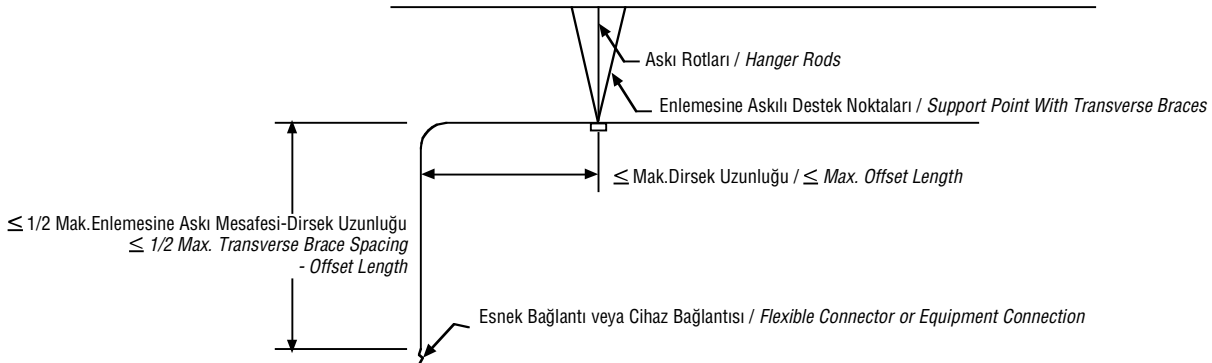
Bracing of pipe drop to equipment supported on floor.
